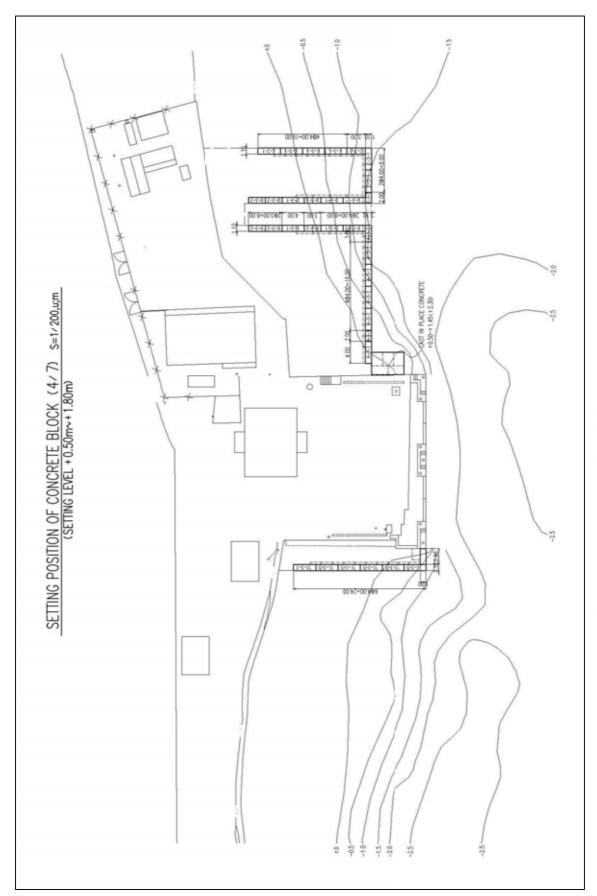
Setting Position of Concrete Block 4th Layer
